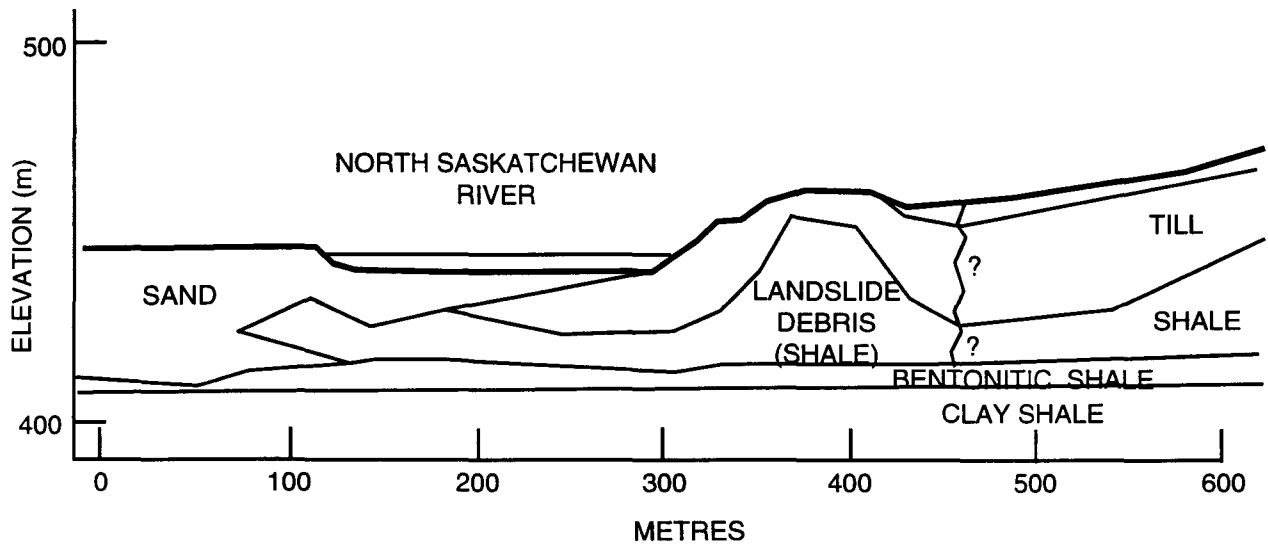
Cross Section of River Valley at Borden Bridge (Wilson et al, 1986)
